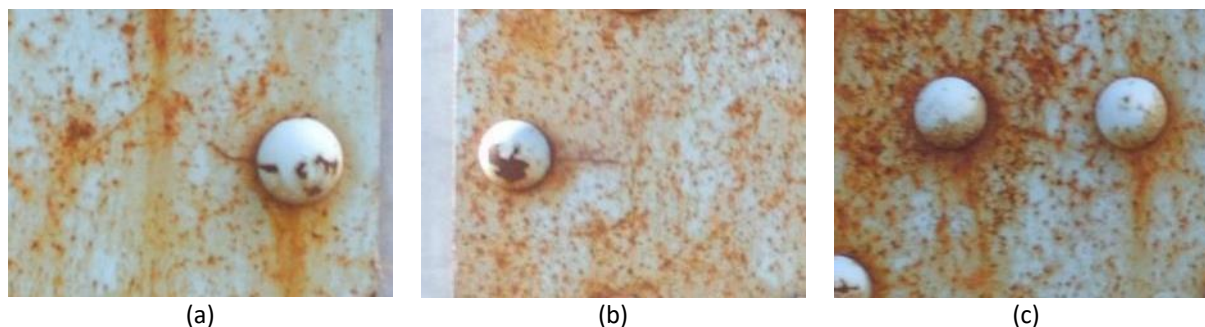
Riveted plate UAV inspection (a) a true positive (hit), (b) a false negative (miss), (c) a false positive.
